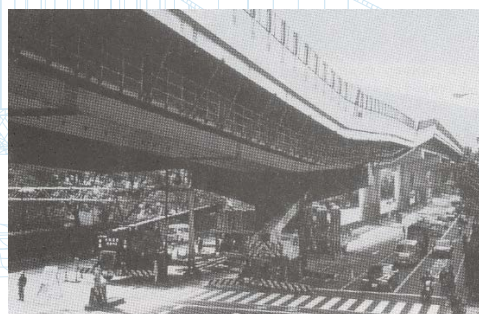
Collapsed bridge section of westbound Santa Monica Freeway due to the Northridge Earthquake.
